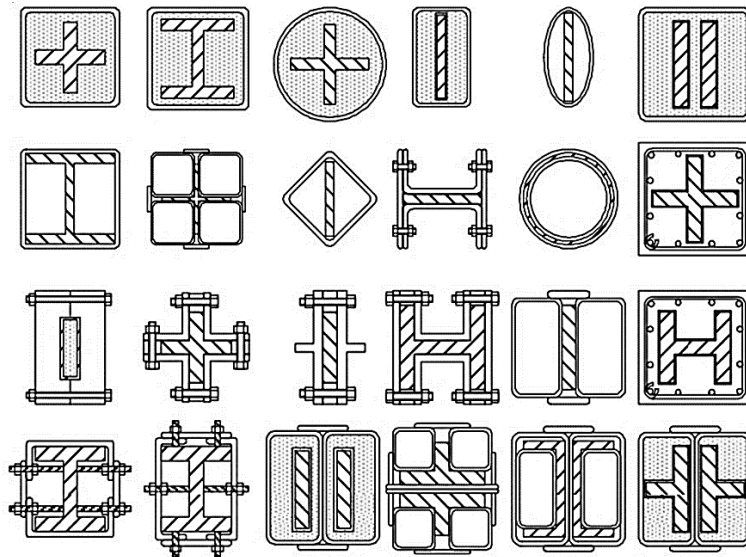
Typical BRB cross-sections (Corte et al., 2005)
